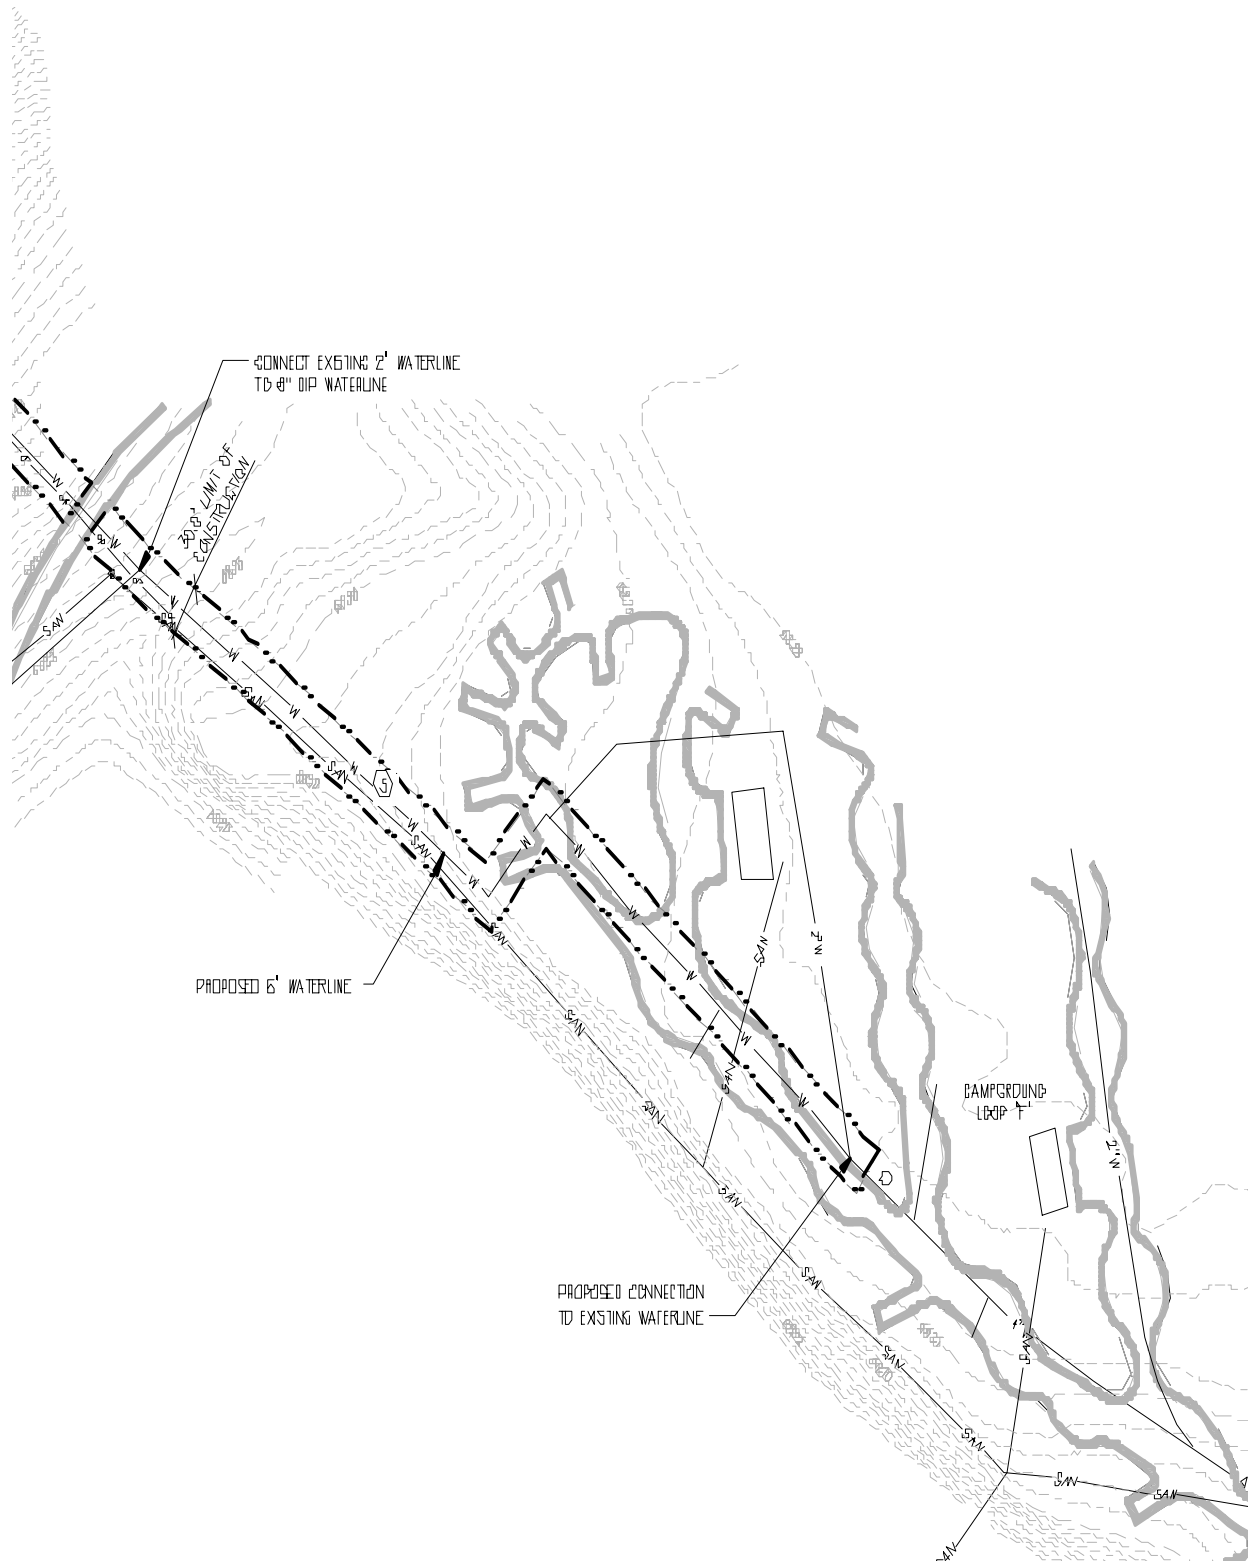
Proposed New Water Line Installation, Madison Wastewater Plant, detail.
